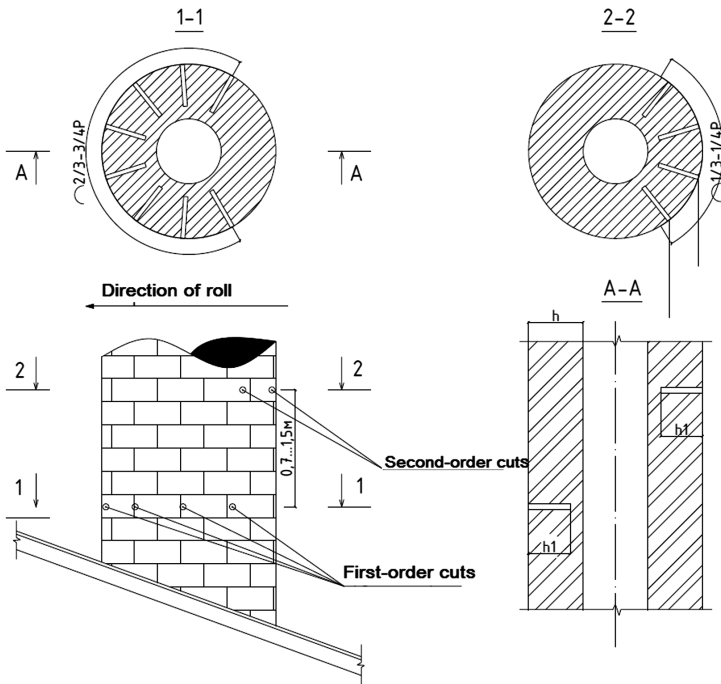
Blastholes layout at a wall demolition in the intended direction.
